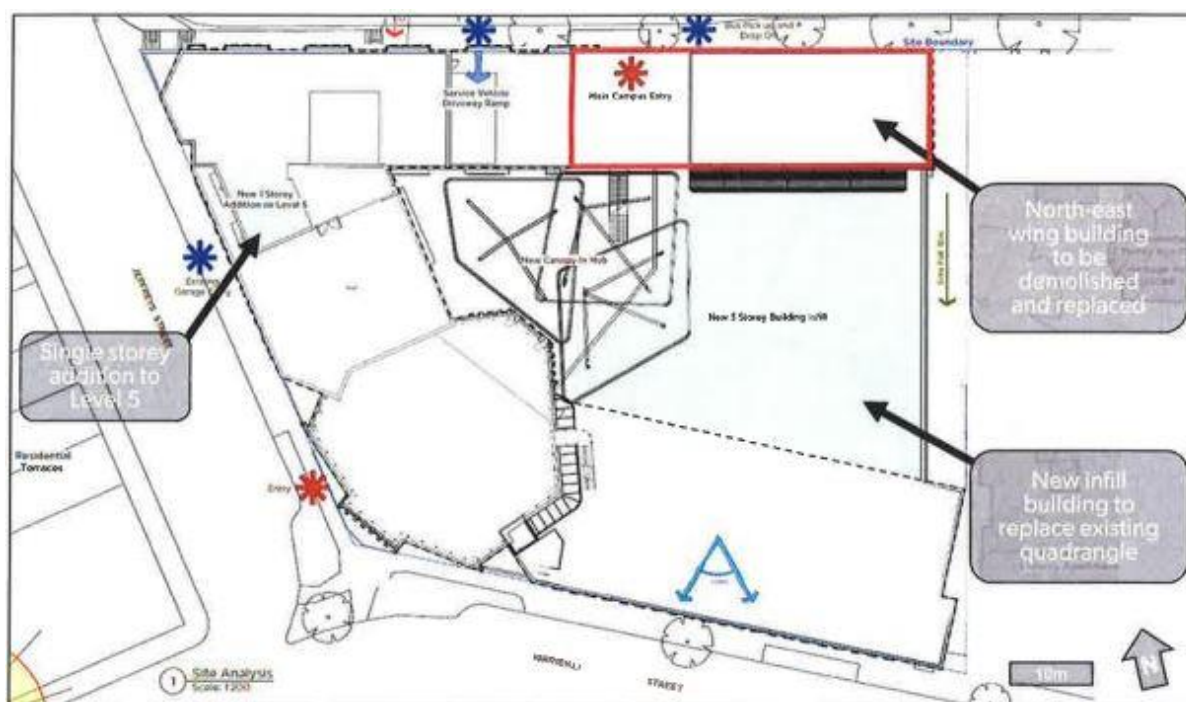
Main Campus Concept Plan layout (Source: Applicant's EIS 2018)
